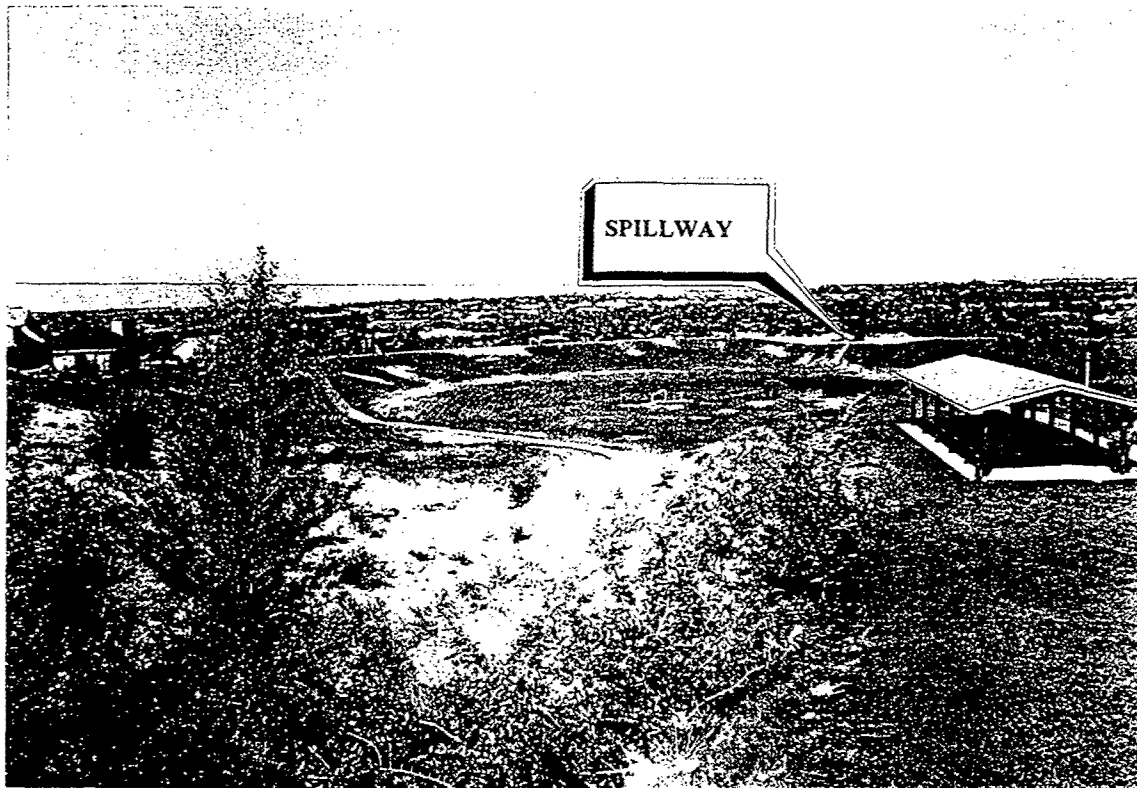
Reach 6 - Looking Downstream - Right Bank - From Geneva Road.
